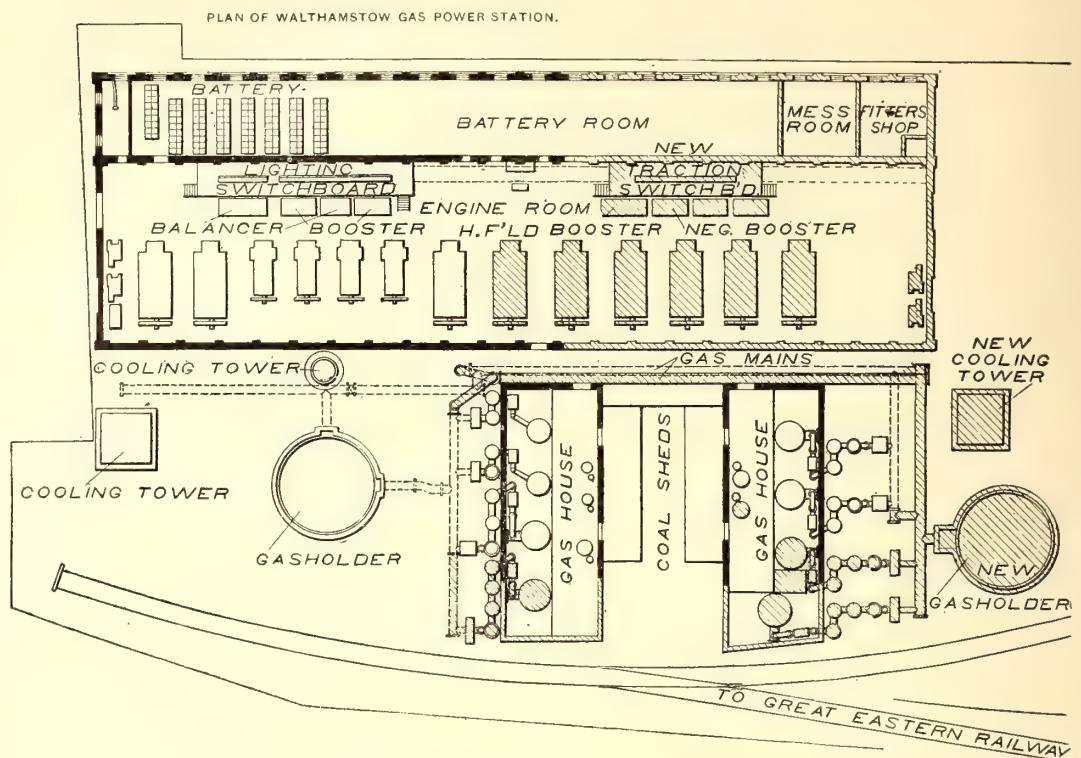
PLAN OF WALTHAMSTOW GAS POWER STATION
